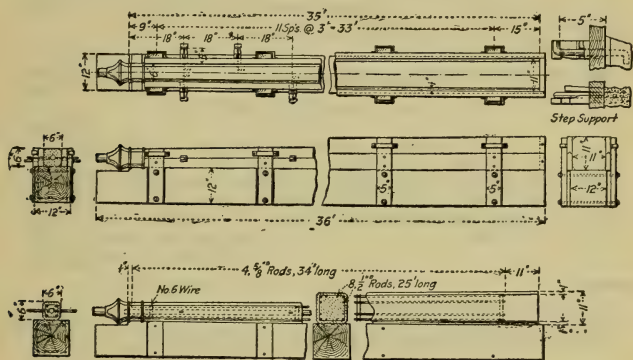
Forms and reinforcement for reinforced concrete electric-lamp poles, St. Marys Falls Canal, Michigan.
